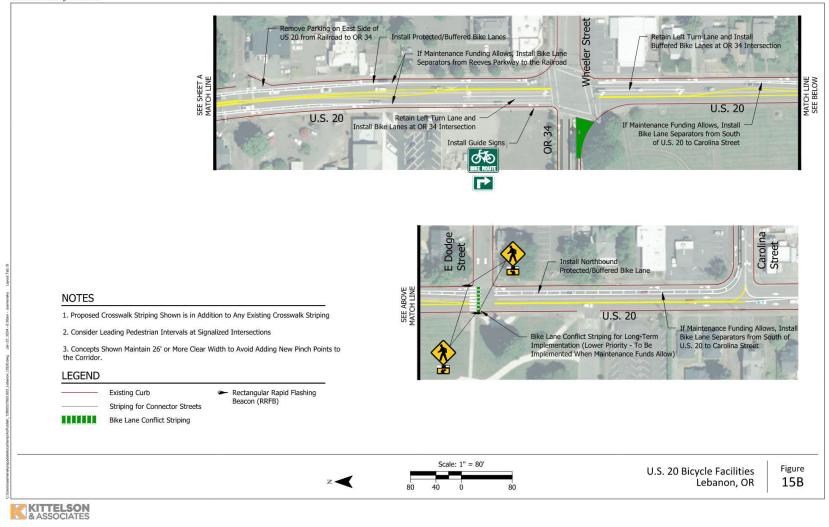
B: U.S. 20 Bicycle Facilities Sheet B
